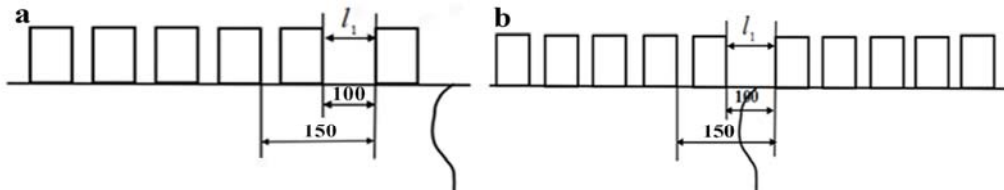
The testing points arrange plan of non cross-stitch and cross-stitch
